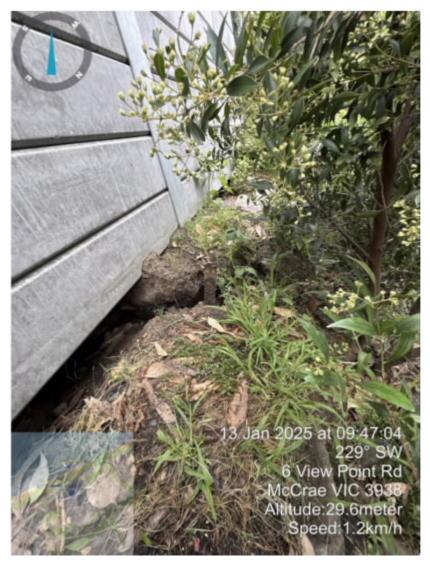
Tension Cracking at toe of retaining wall at 10-12 View Point Road (MSC.5035.0001.0033)
